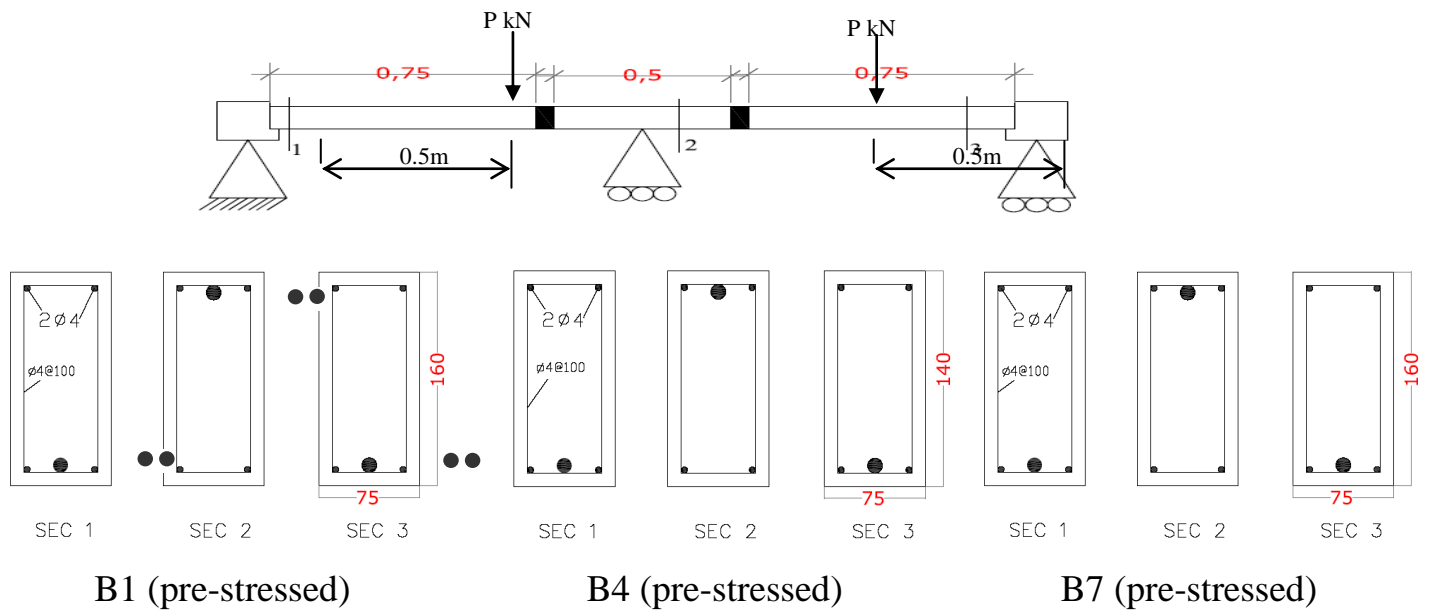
Dimensions and reinforcement details of Girders (B1, B4, and B7).
